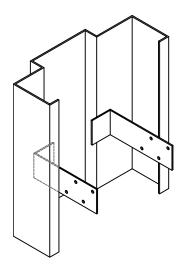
Weld in strap anchors wood/steel studs
